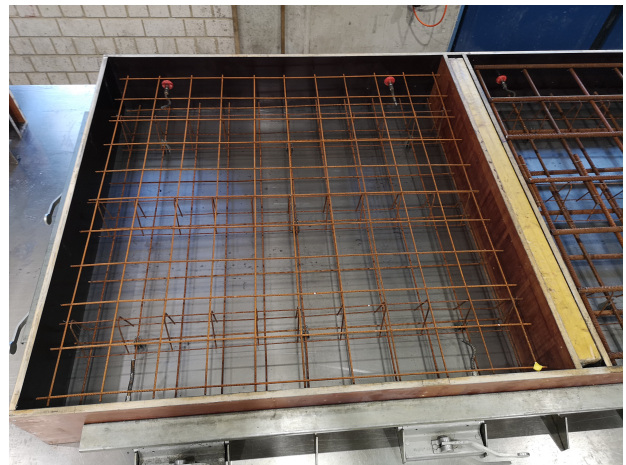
Test specimen 2 rebar mat before the concrete pour.
